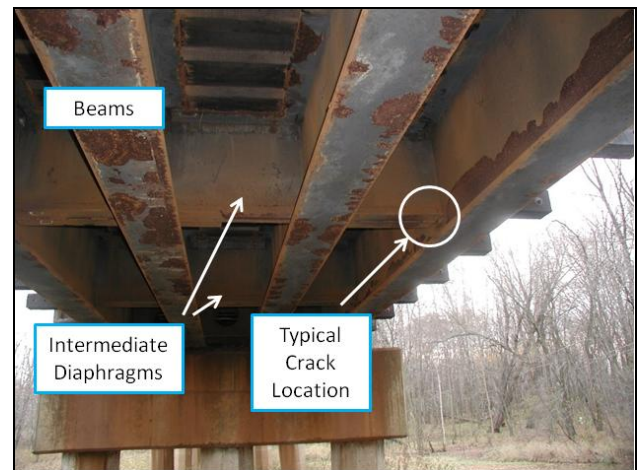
Underside of Test Bridge Showing Location of Weld Details
